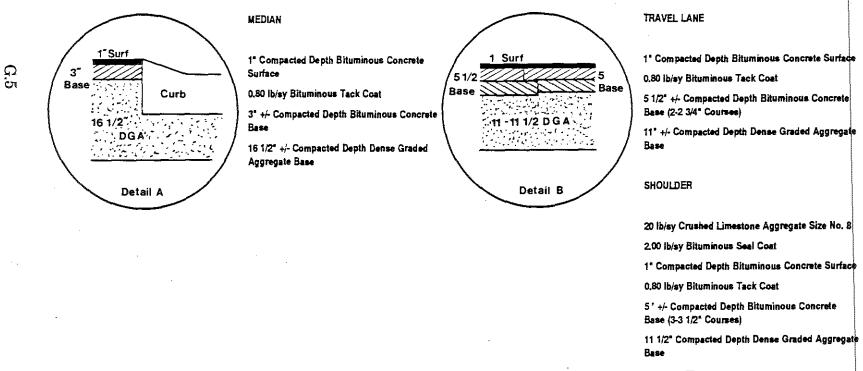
Typical Section and Detail for Main Line Section of Hazard Bypass.
